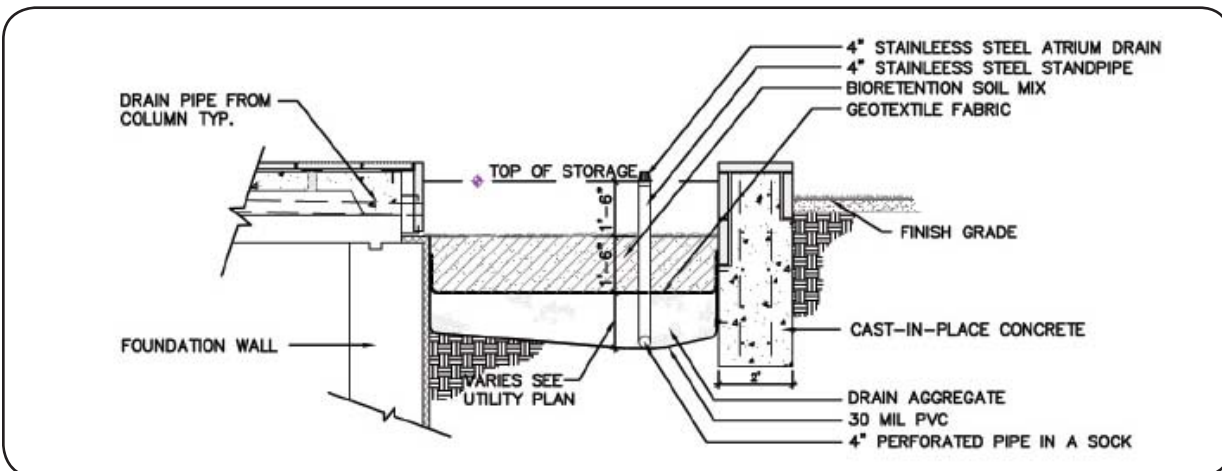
Typical Construction Detail of Flow-Through Planter (JJR)
